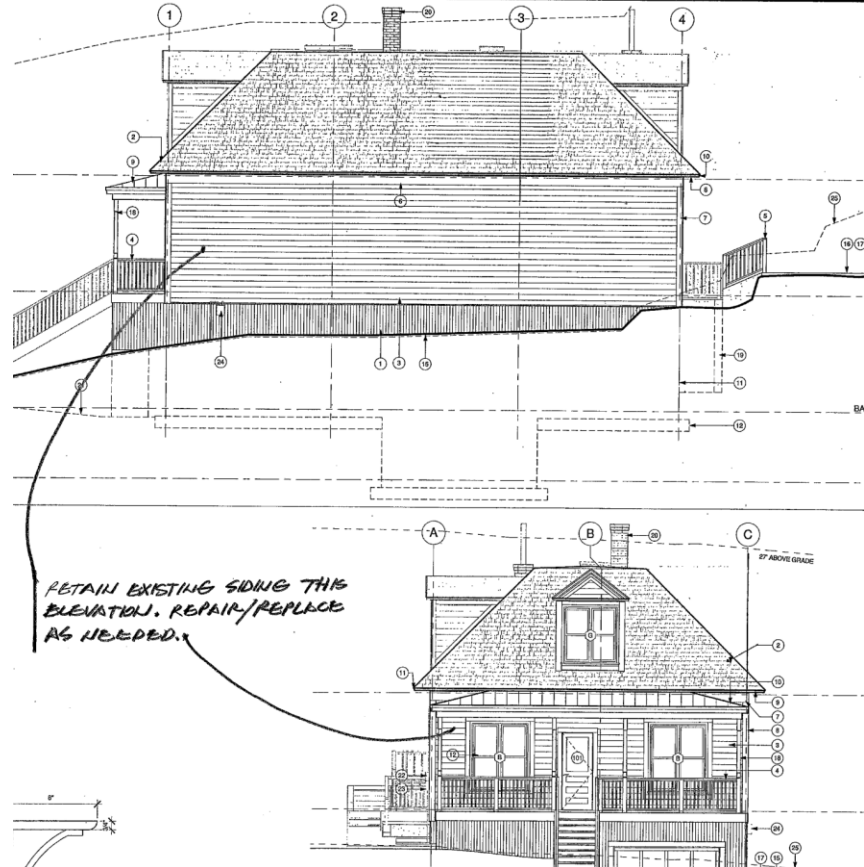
Proposed East Facade to be repaired/ replaced as needed
